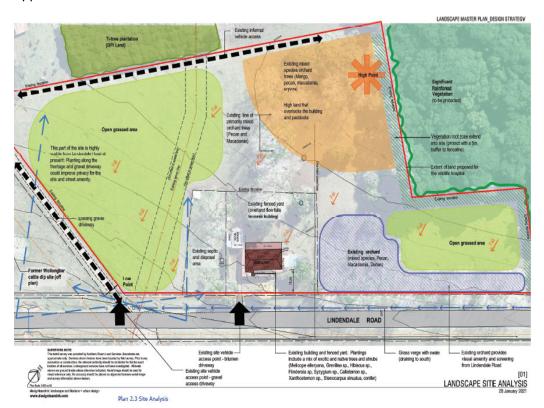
Landscape Site Analysis Plan DA 2021/185
